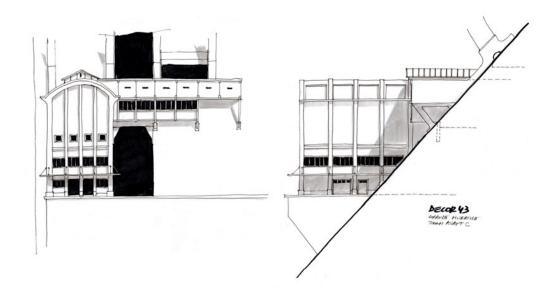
Elevation enterence of the alleyway where Ilona is kidnapped, Encre and pentone on tracing paper
